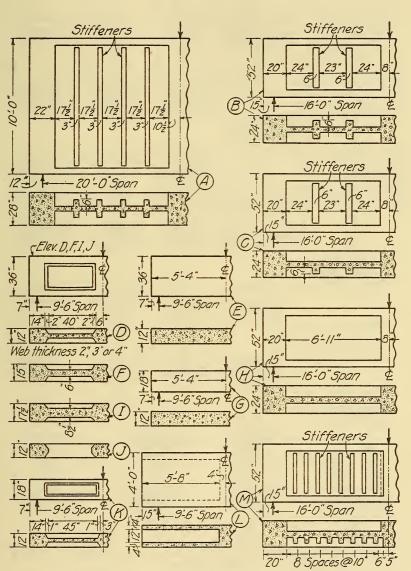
Side elevations and longitudinal sections of test beams 71966°—26†——2
